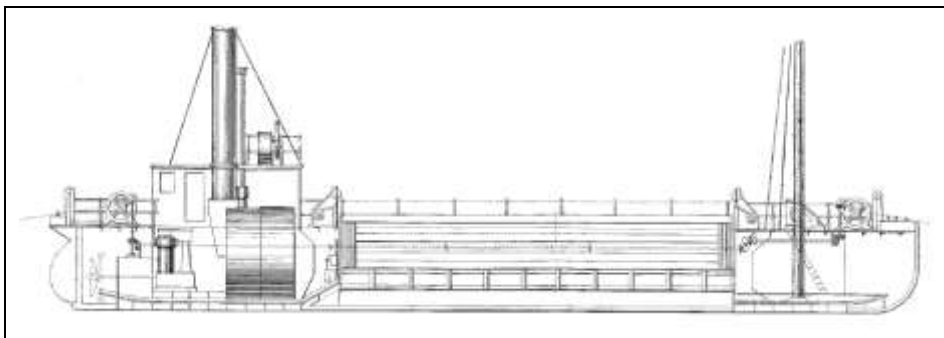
Bottom-dumping barge for concrete – filled bags
